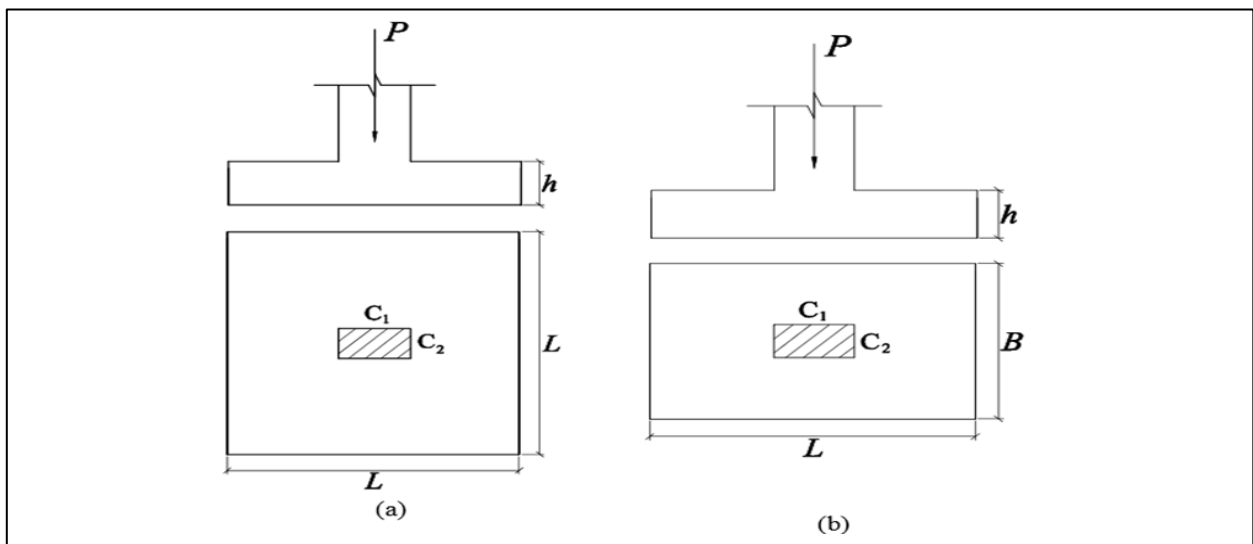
(a) Square isolated footing; (b) Rectangular isolated footing
